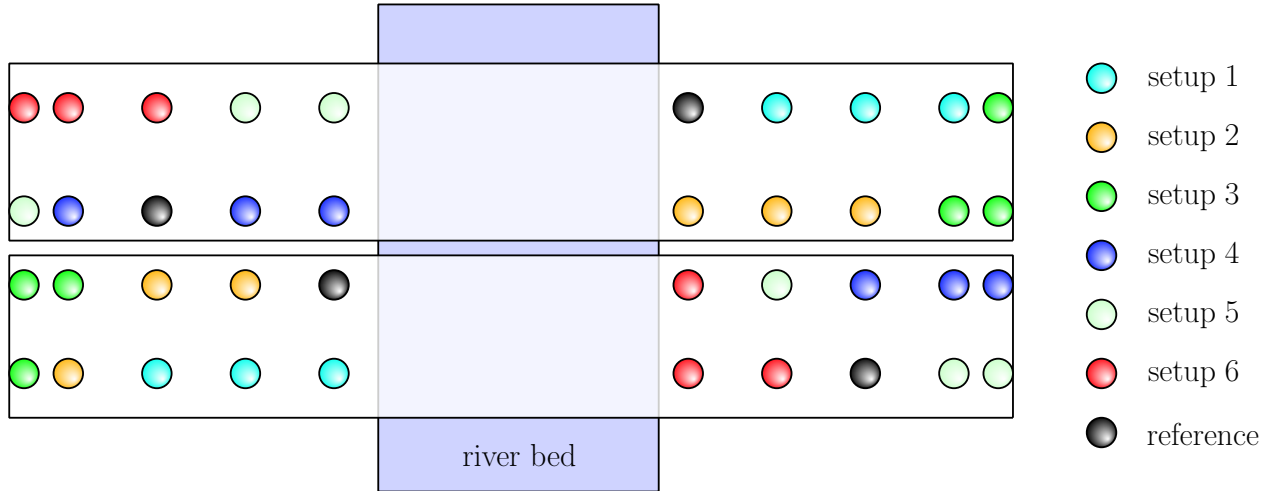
Investigated railway bridge: sketch of measuring points instrumented in six setups in plan view
